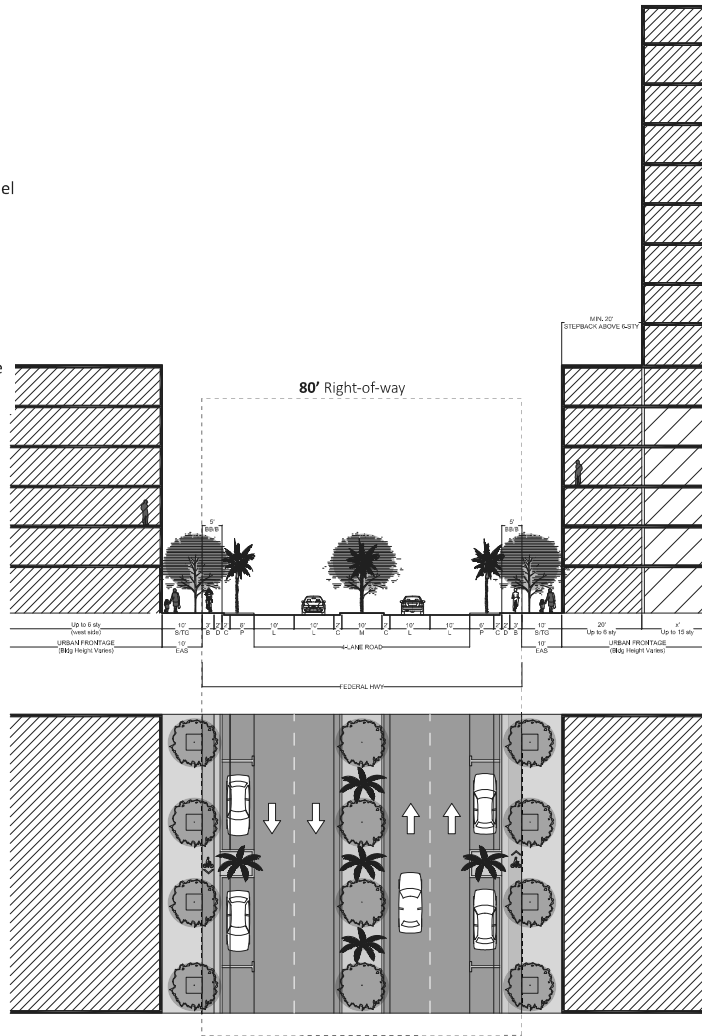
Federal Hwy Street Section/ Plan - Alternative 2: On-Street Parking
